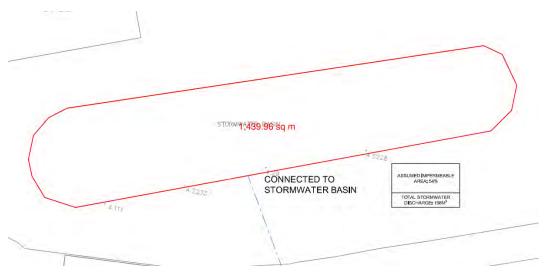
Proposed Stormwater basin (taken from Hydraulic Services Plan, VIC-BAR-HYD-A002, Rev B)
